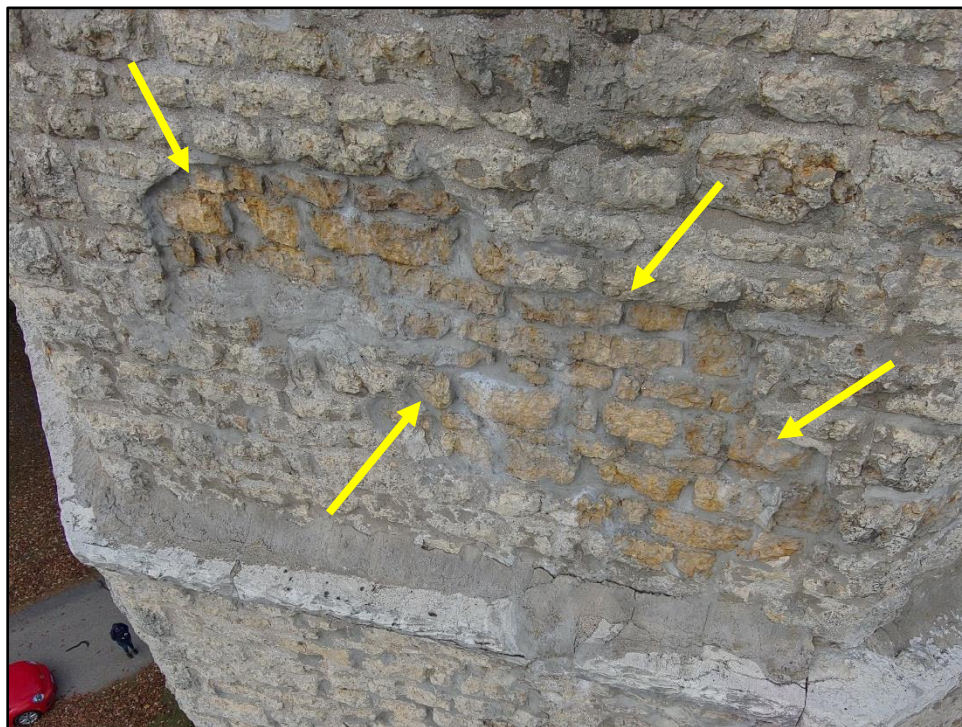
Area of spalled stone – top tier, southeast elevation
